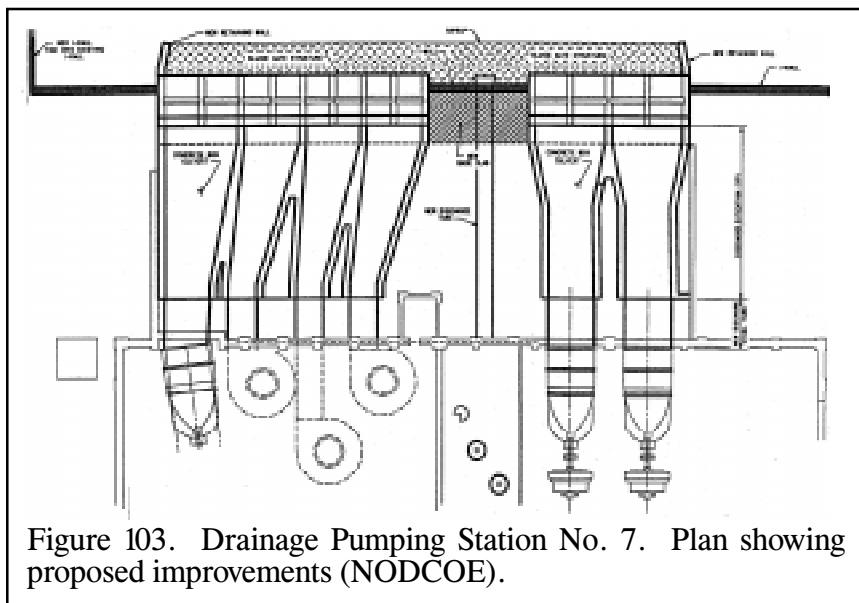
Drainage Pumping Station No. 7. Plan showing proposed improvements (NODCOE).
